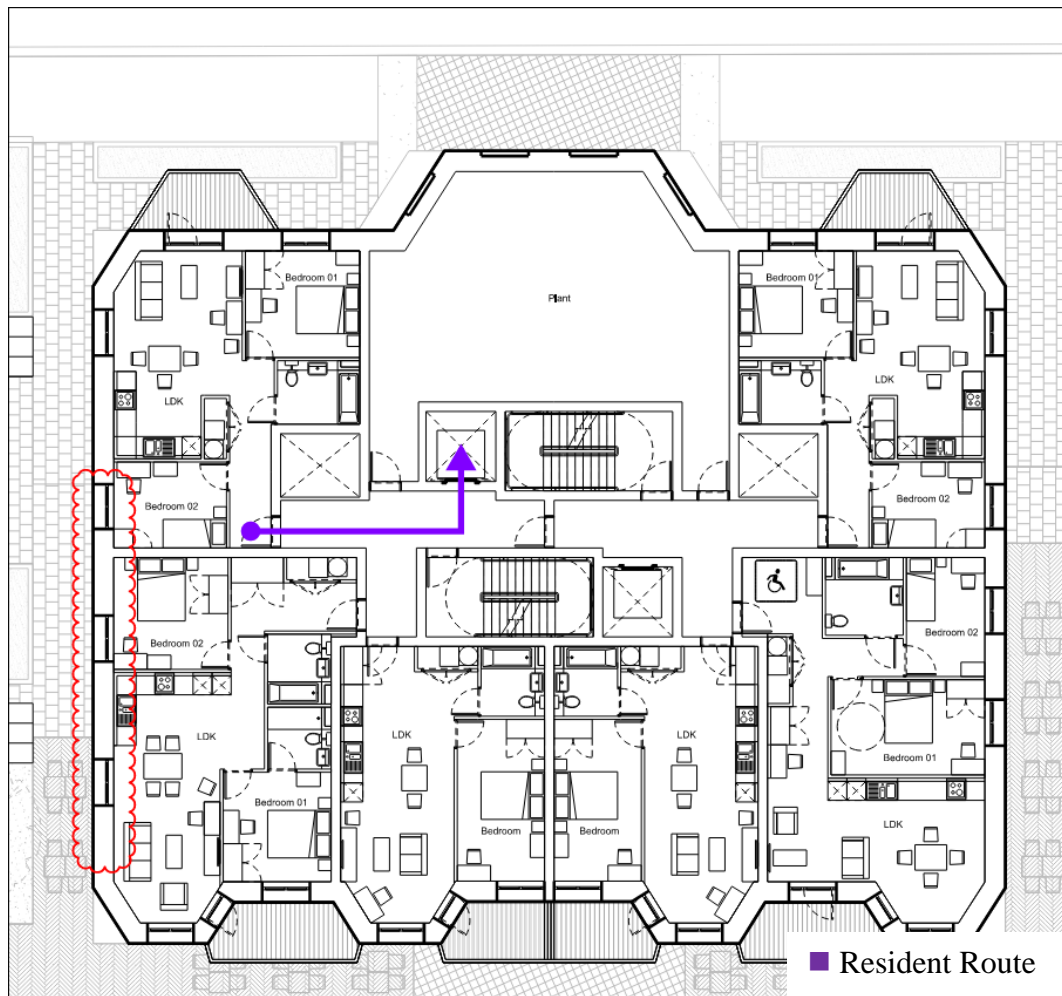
Longest residential waste conveyance route N3-E (typical upper floor)
